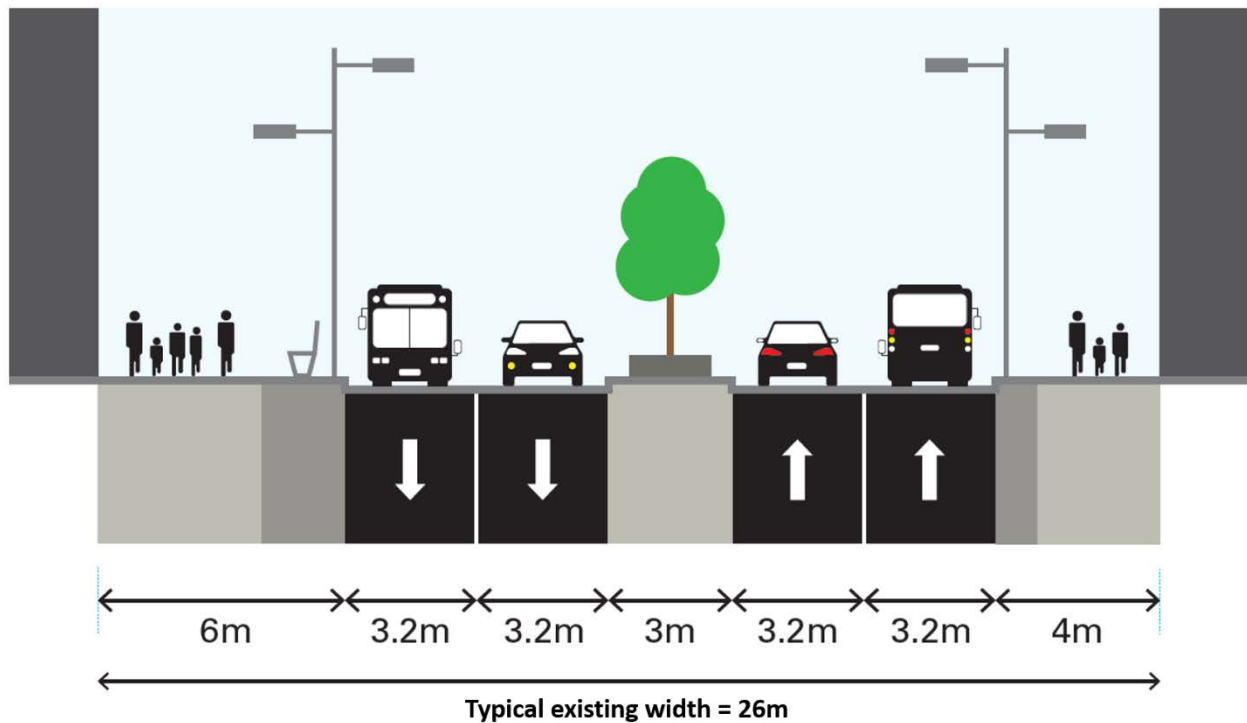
Typical Cross Section from College / Carlton Street to Gerrard Street
